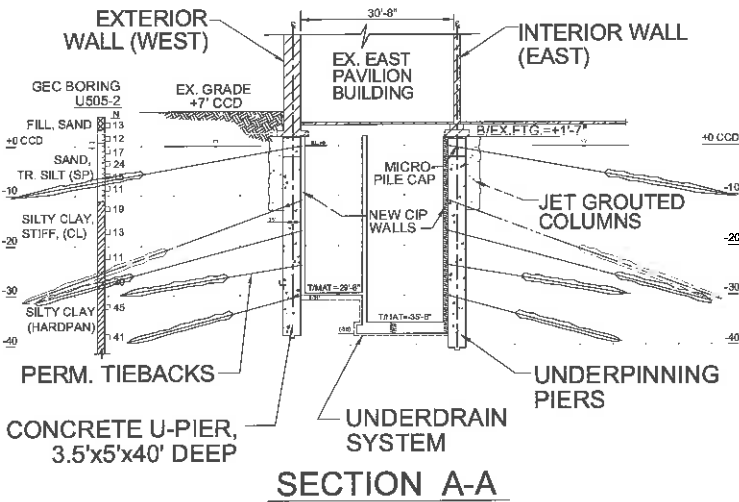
East Pavilion Section (from Figure 5 - Partial Plan)
